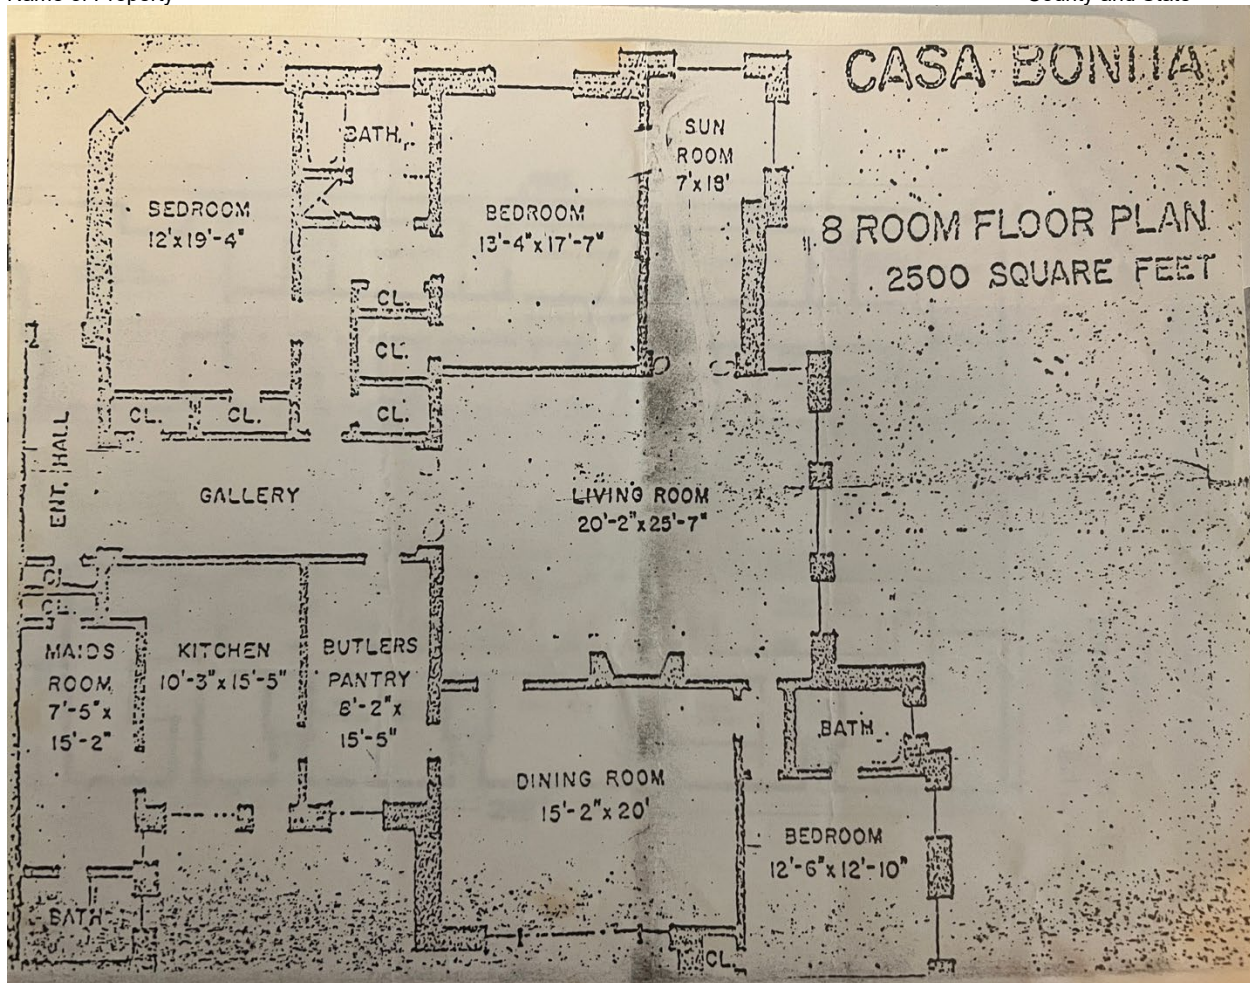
Older floor plan naming butler's pantry, maids room and 8 room apartment layout.
